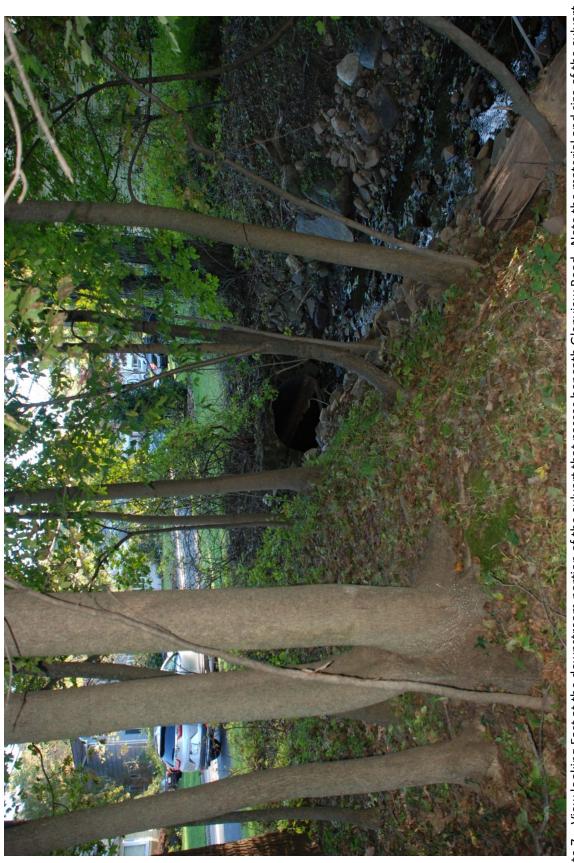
View looking East at the downstream portion of the culvert that passes beneath Glenview Road. Note the material and size of the culvert changes as it passes through Glenview Road. The culvert passing under Glenview Road is comprised of two pipes in series. The first pipe is a 36" reinforced concrete pipe (RCP), followed by a 60"x41" corrugated metal elliptical pipe (CMEP).
